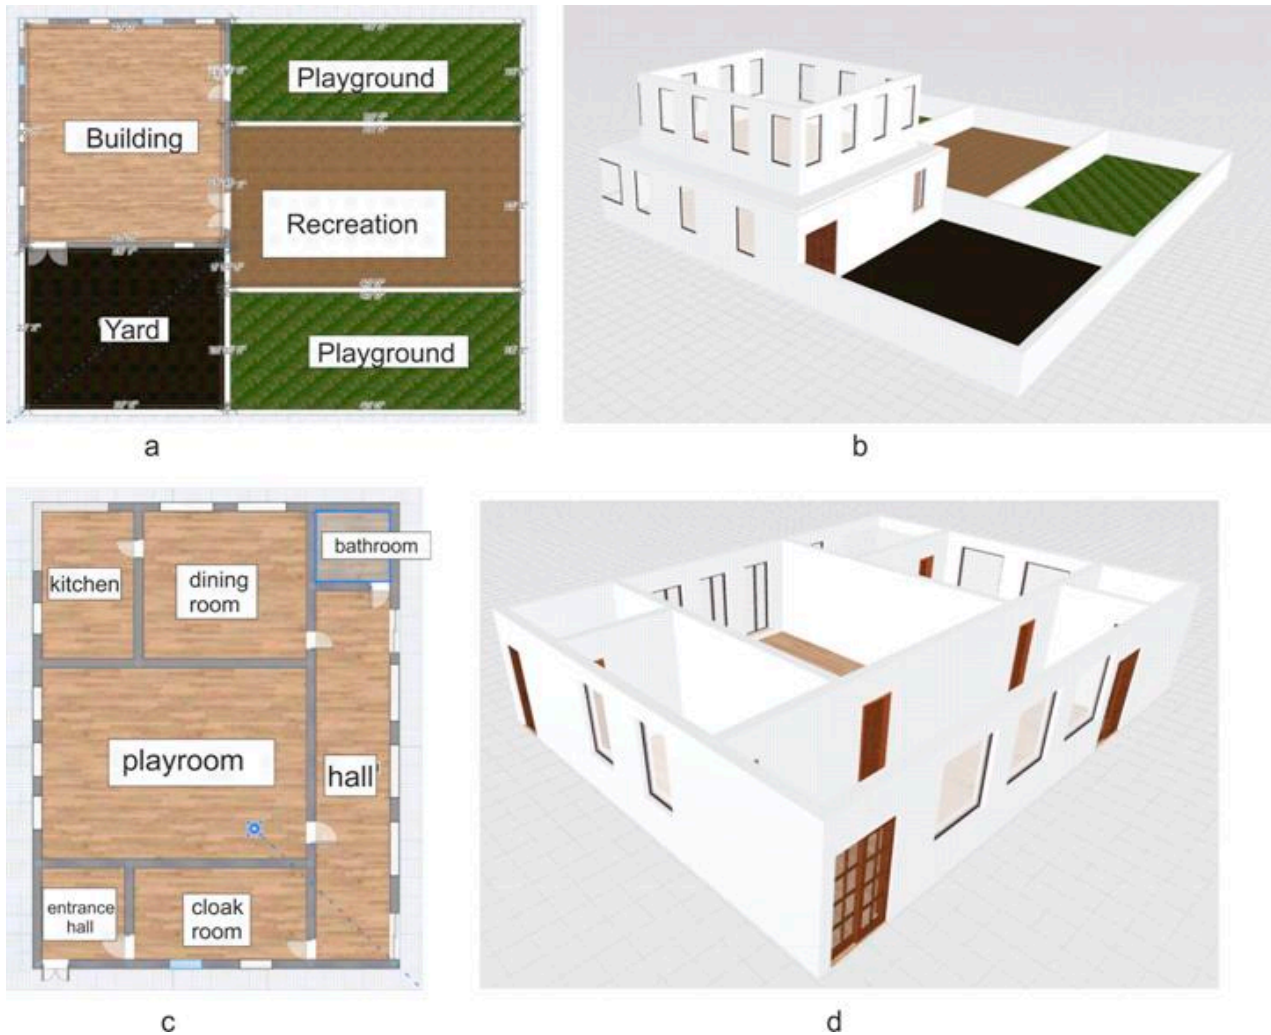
(a) A view of kindergarten grounds; (b) a 3D view of these grounds; (c) a detailed view of the ground floor; (d) a 3D view of the ground floor.
